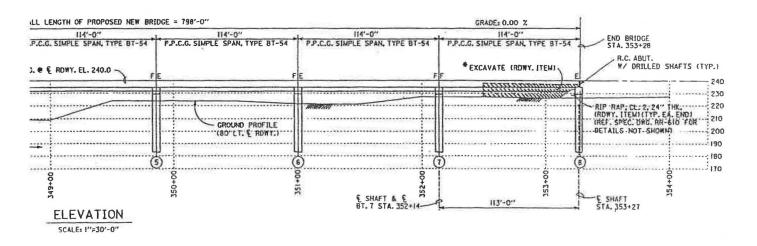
(continued) Plan and Elevation Views of the Uphapee Creek Bridge
